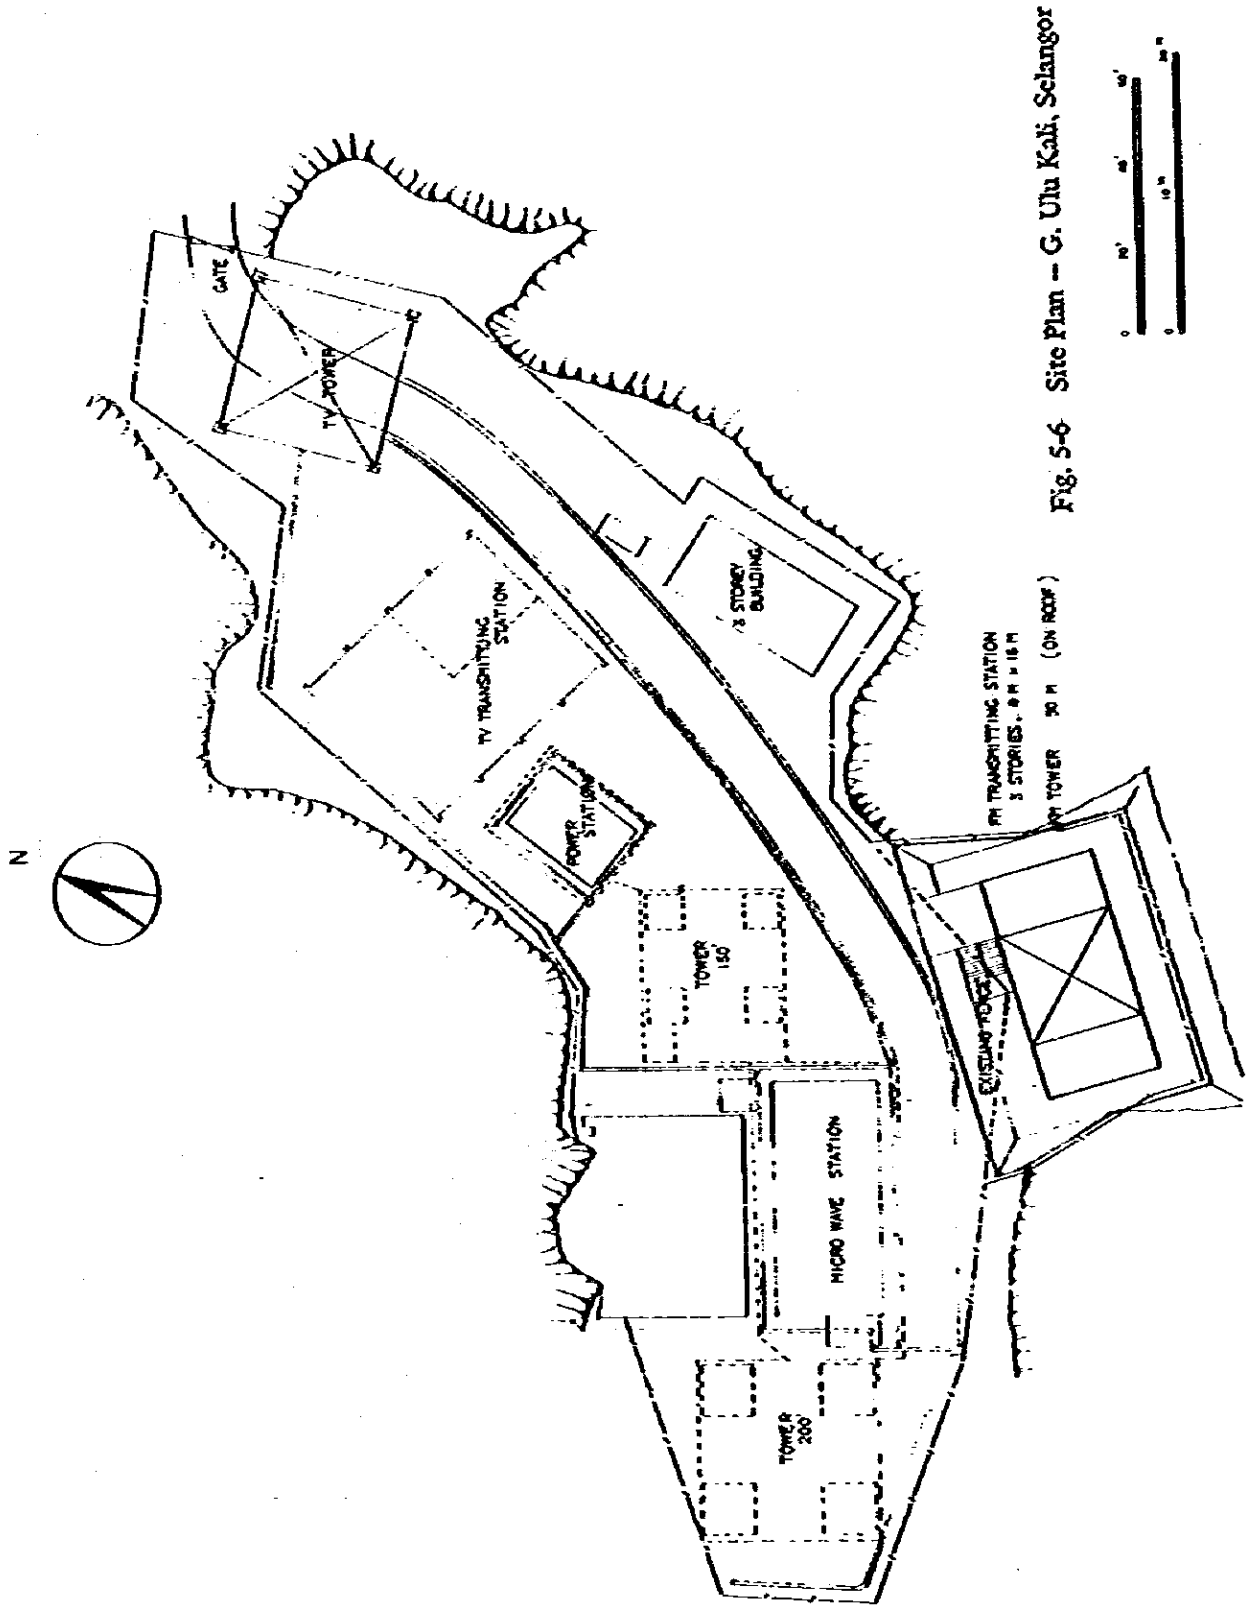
Site Plan -- G. Ulu Kali, Selangor
